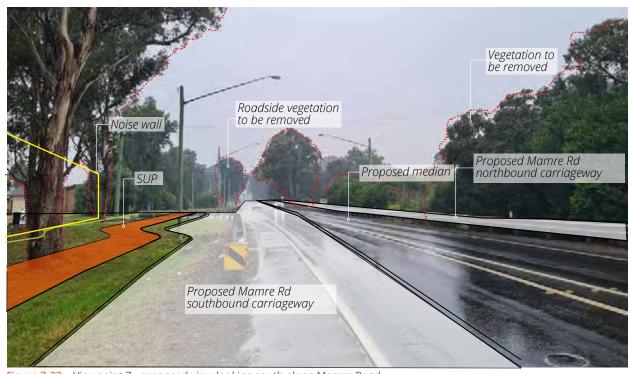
Viewpoint 7 - proposed view looking south along Mamre Road
